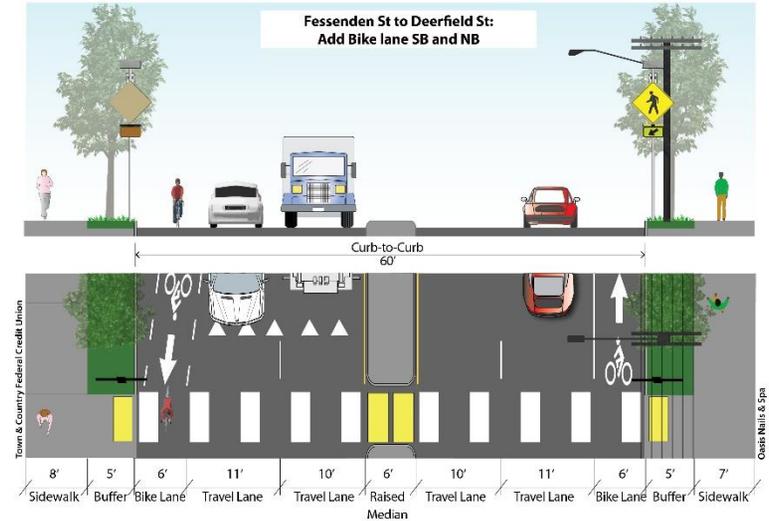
Alternative 1 – Forest Avenue from Deerfield Road to Fessenden Street
